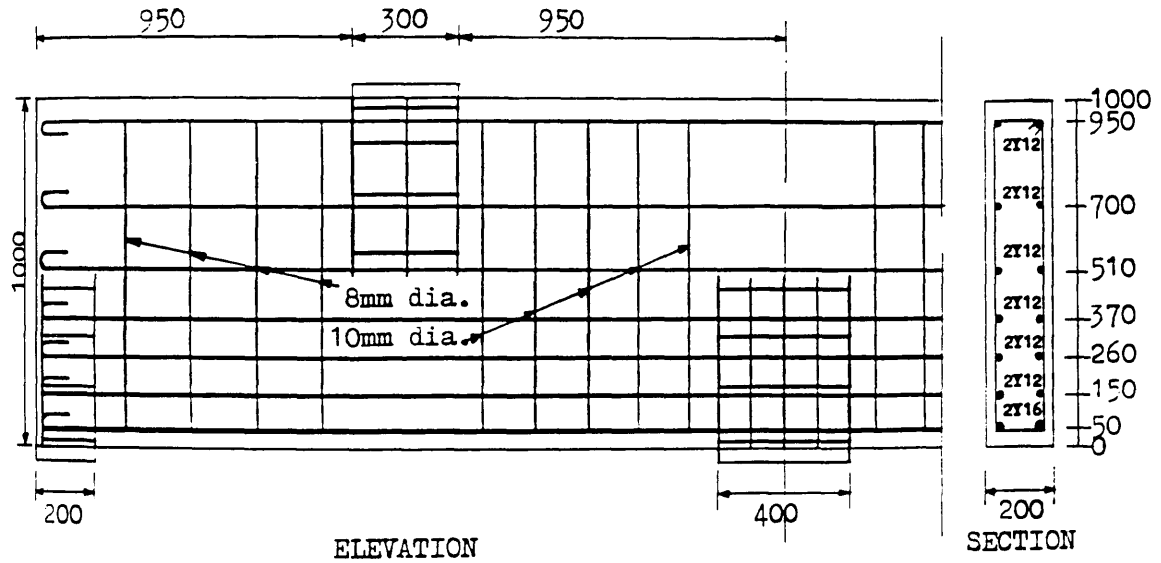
Dimensions and details of Beam 3 designed by direct design method
